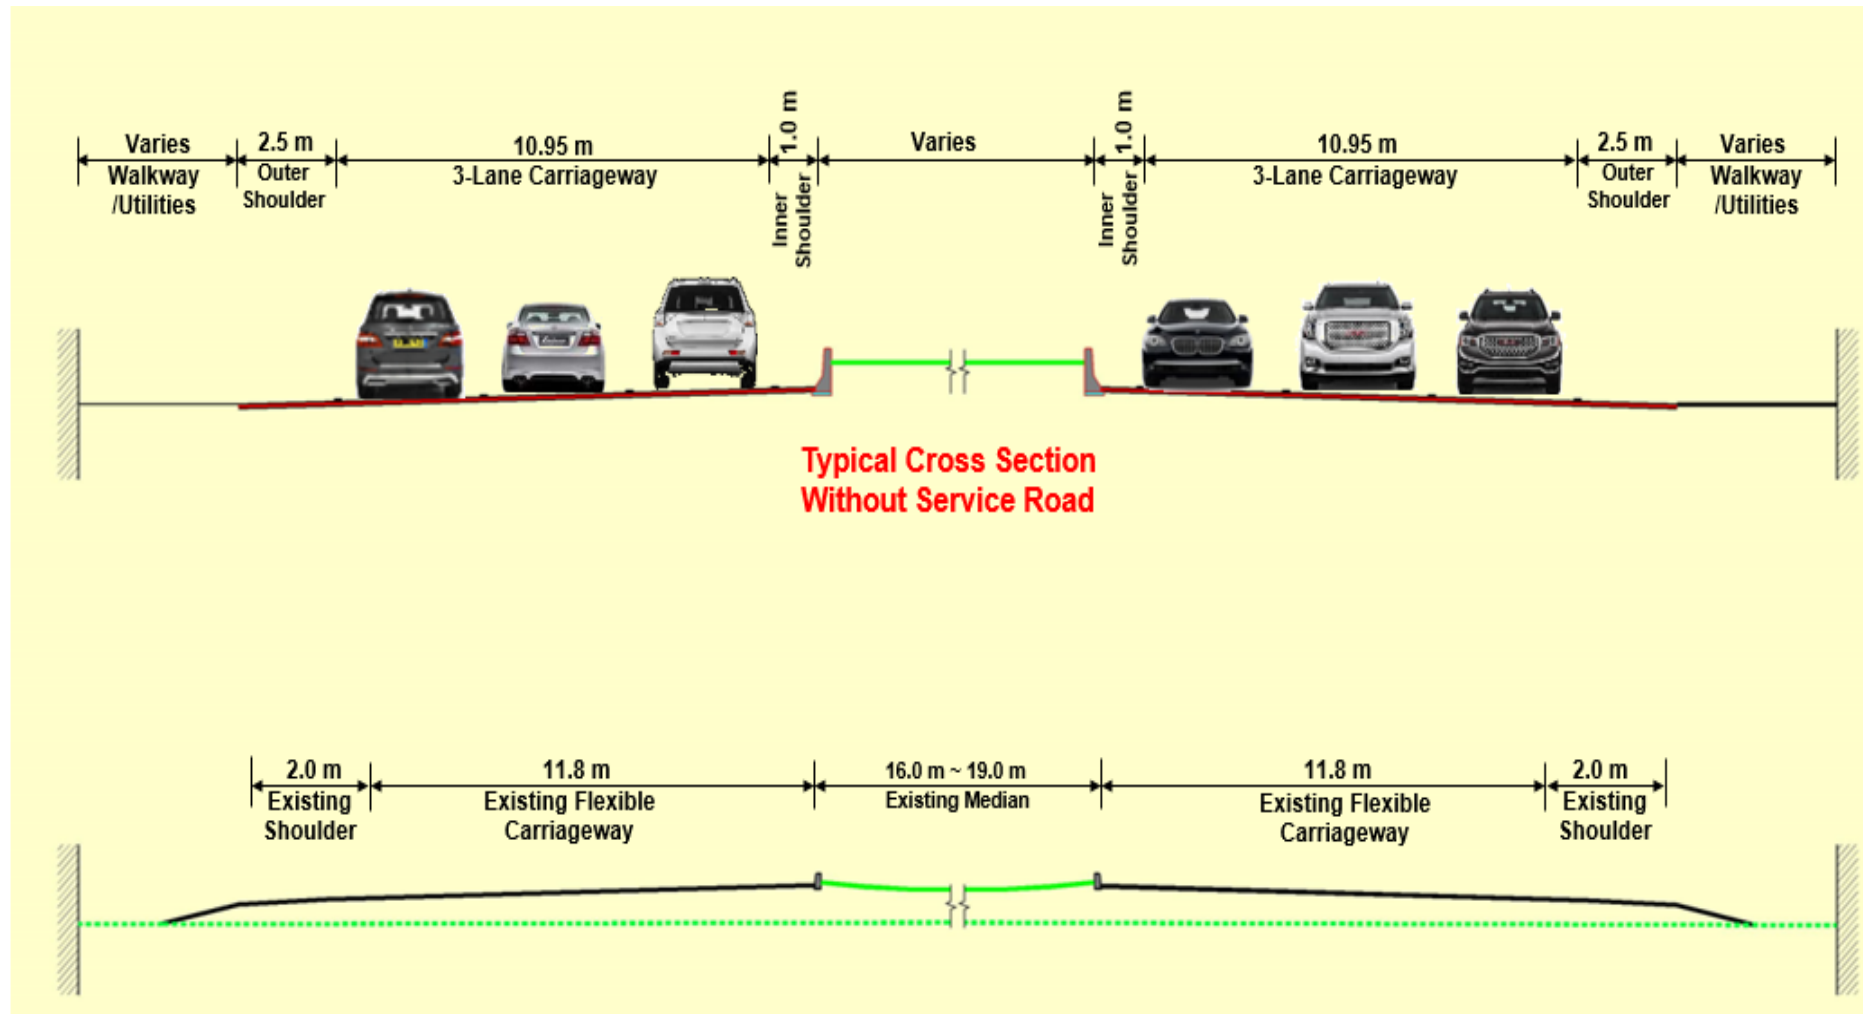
Typical Cross Section of the 3 Lane Road without Service Road
